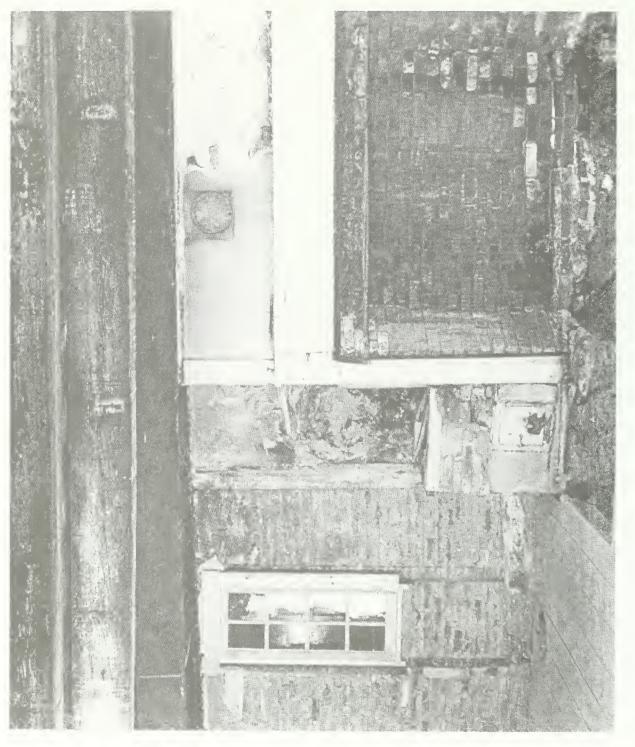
Schuyler House: First story of kitchen wing after ca.-1815 lath and plaster removed; view of east wall showing post-1780 window, fireplace, mantel, and boiler station (1958).
